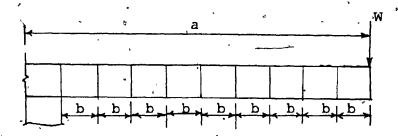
Cantilever main span acted upon by load of construction equipment.
